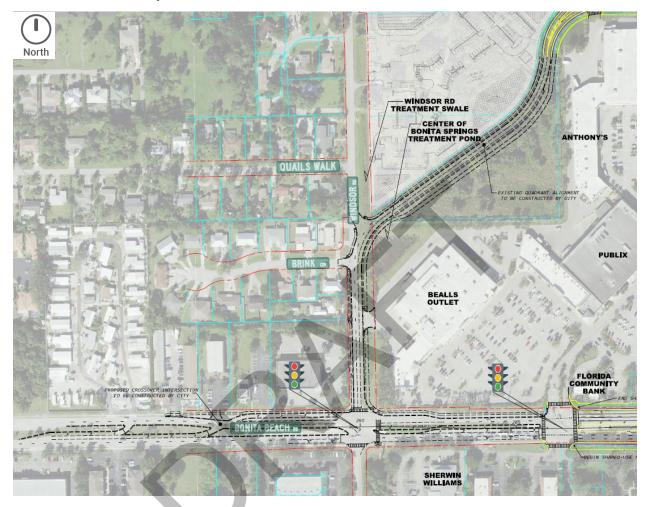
Northwest Quadrant Roadway – Proposed City Alignment
